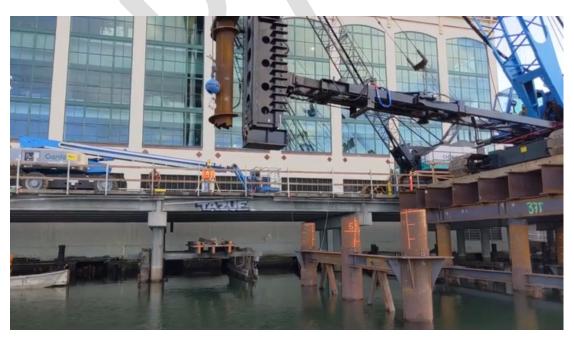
Example of Temporary Work Trestle Supported by Helical Piles: Fairview Avenue Bridge, South Lake Union, Seattle, Washington
